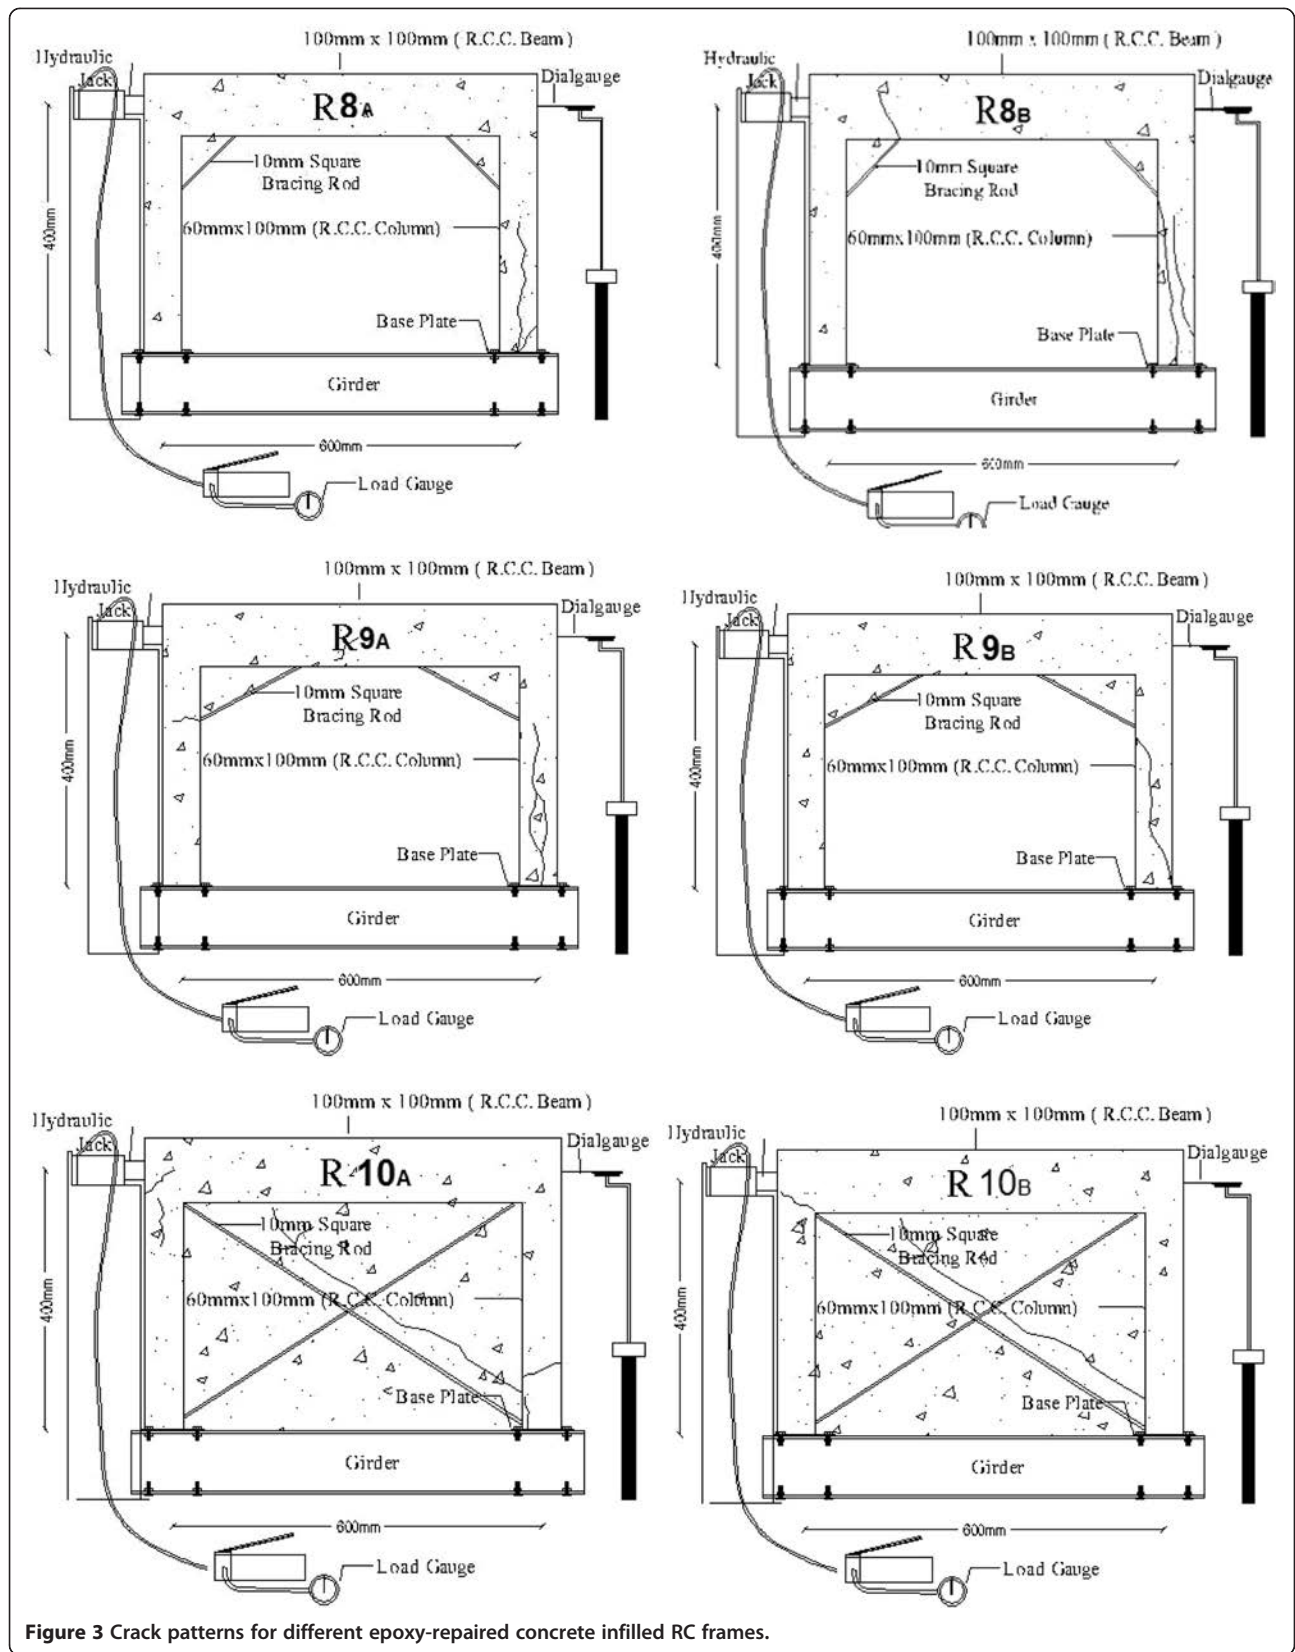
Crack patterns for different epoxy-repaired concrete infilled RC frames.
